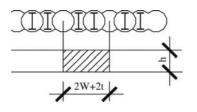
The stiffness equivalence between SMW and diaphragm wall.
